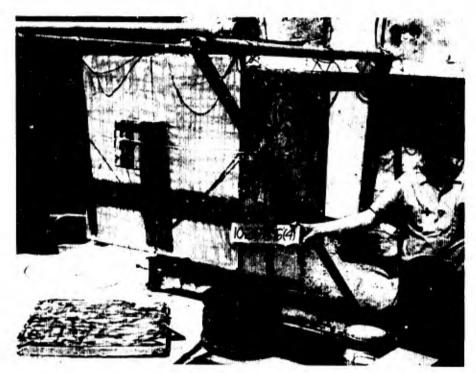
Assembly Ready to be Placed Underwater
